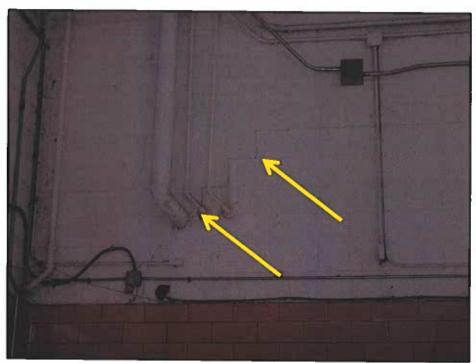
Diagonal Step Cracks in the CMU walls
